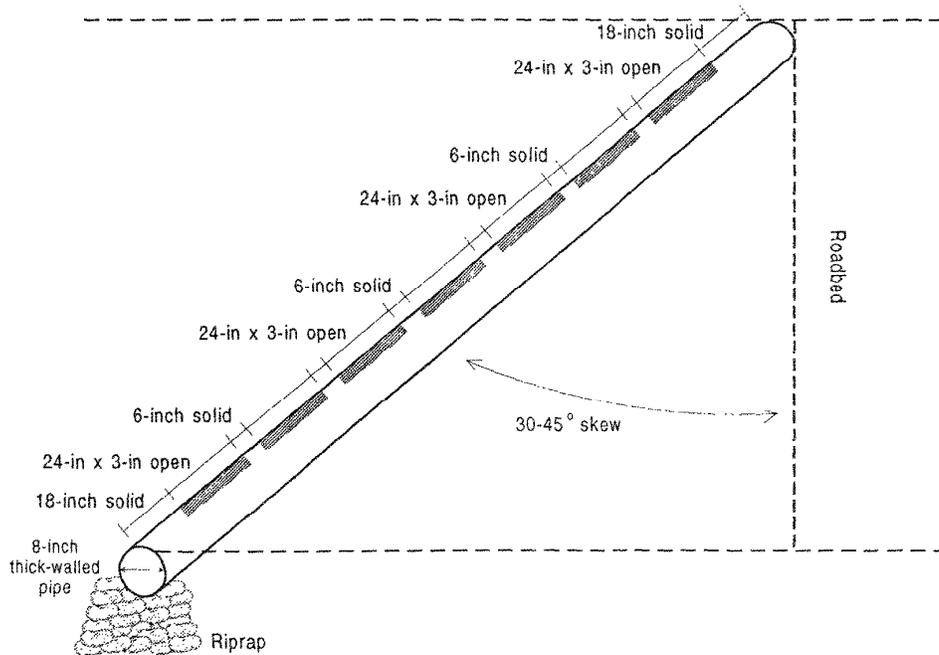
Layout and dimensions of an open-top pipe culvert.
